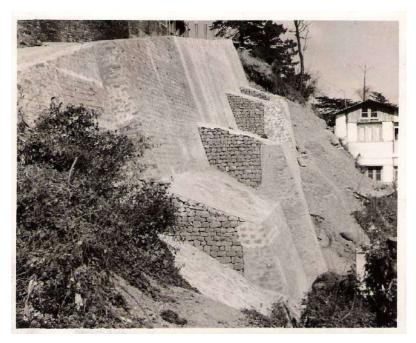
Retaining wall to support a road at Shimla (H.P.)
